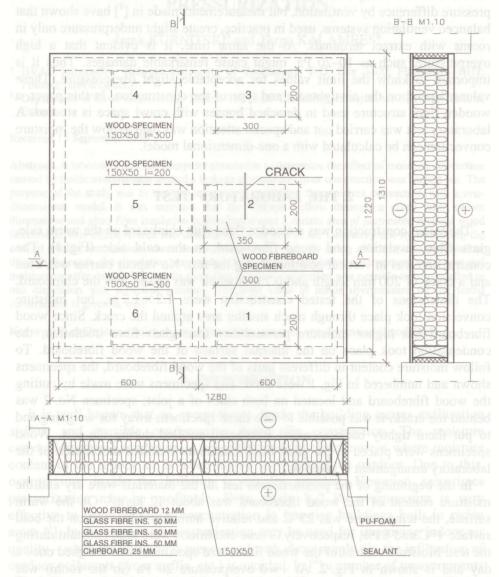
Dimensions of the construction and location of the wood specimens and of the wood fibreboard specimens (numbered from 1 to 6).
